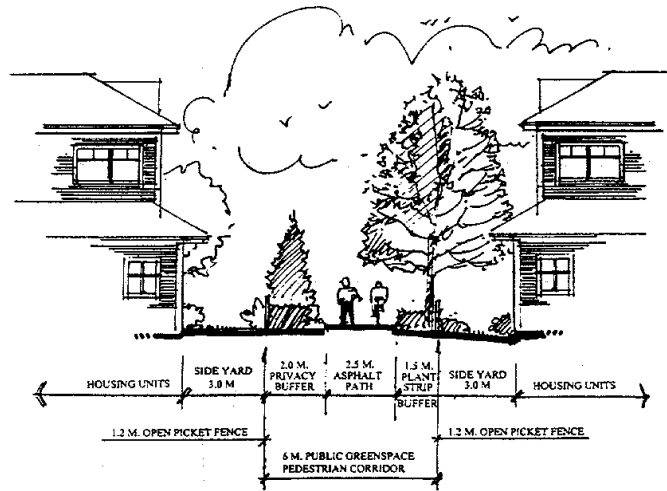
CROSS SECTION - PATHWAY & GREENSPACE BETWEEN RESIDENTIAL UNITS (Scale: 1:250)
